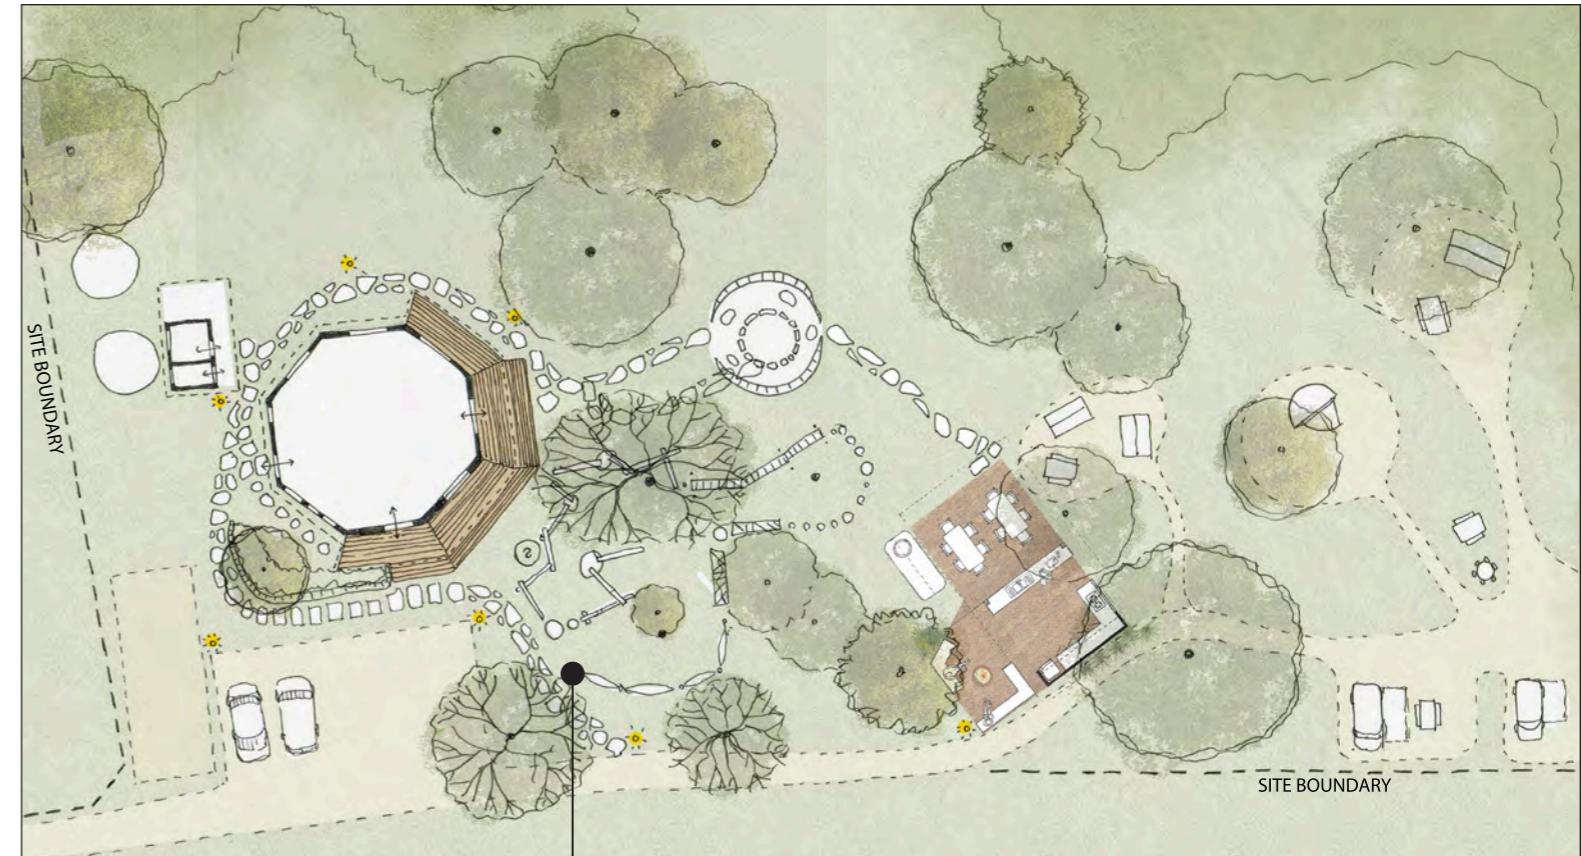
Option 3 - Site Plan - Indicating location of proposed outdoor kitchen (NTS)
